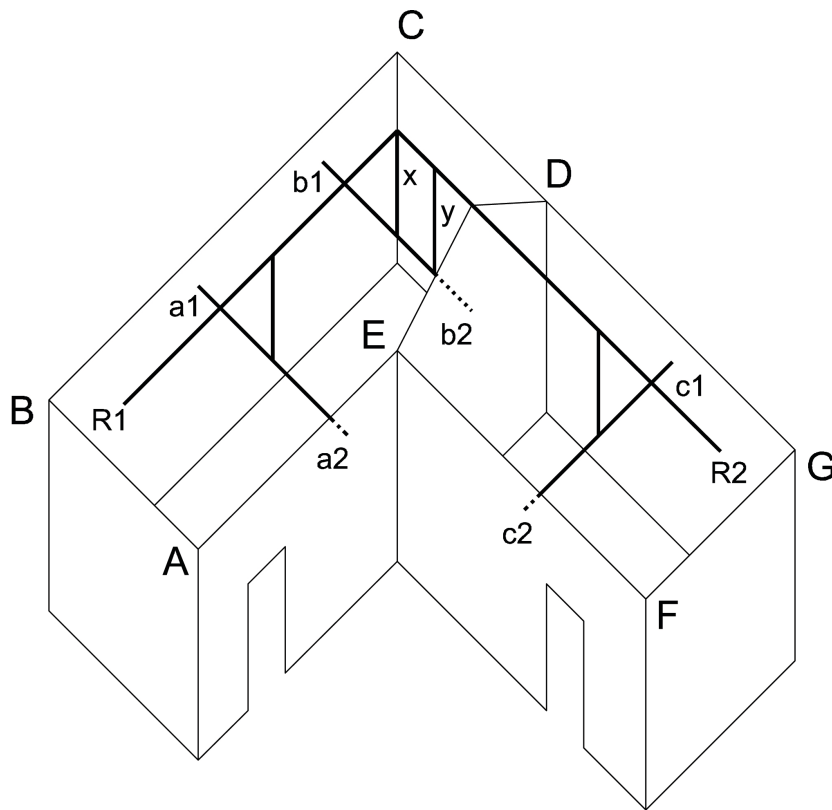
Diagram showing the geometry of roof members in L-shaped roof in courtyard houses
